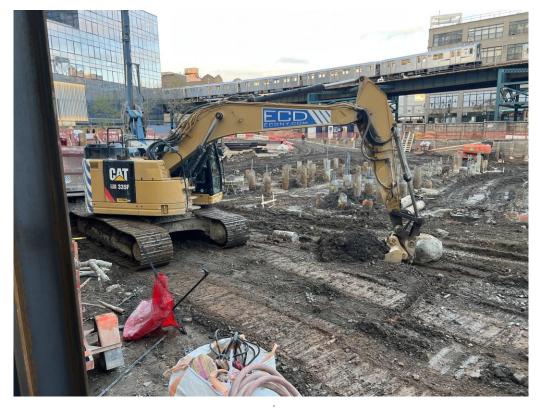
ECD excavating and live-loading hazardous soil/fill from WCG COMP J (facing southwest).
